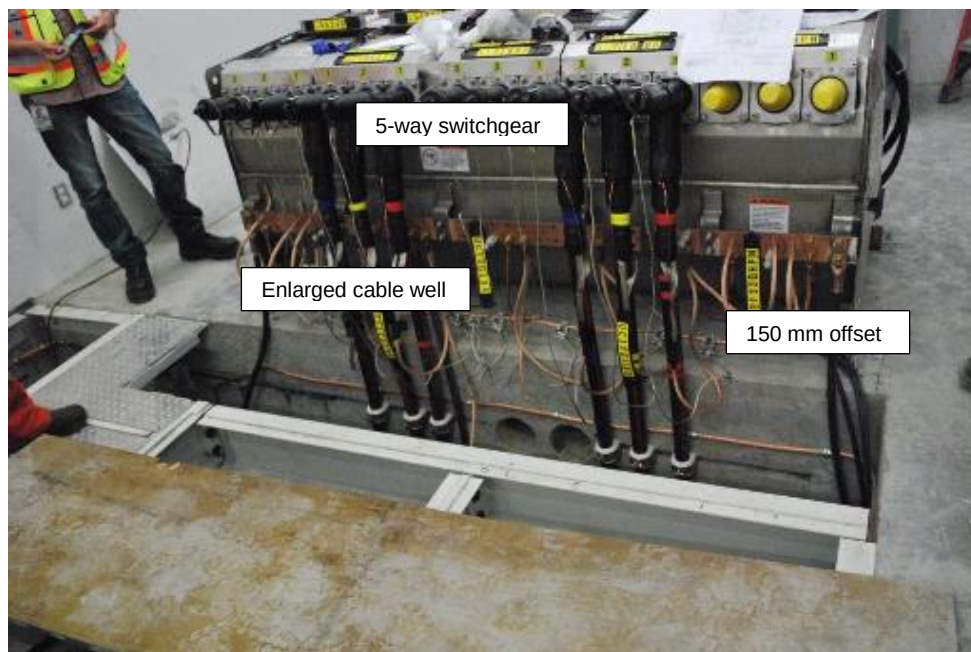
5-Way Switchgear with Enlarged Cable Well
